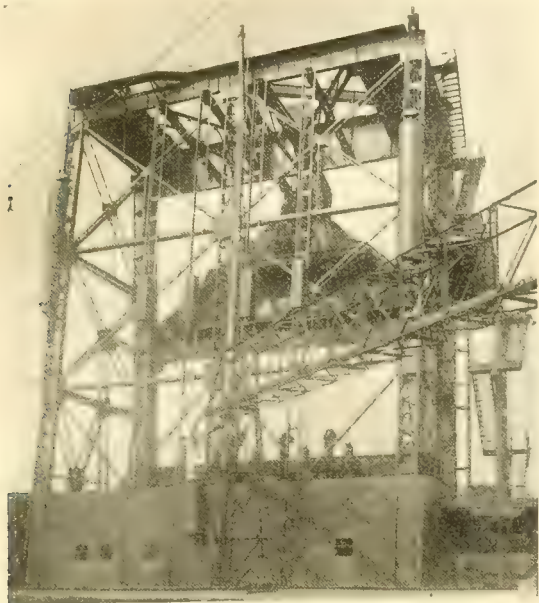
BACK VIEW OF CAR DUMPER OF FIG. 1
